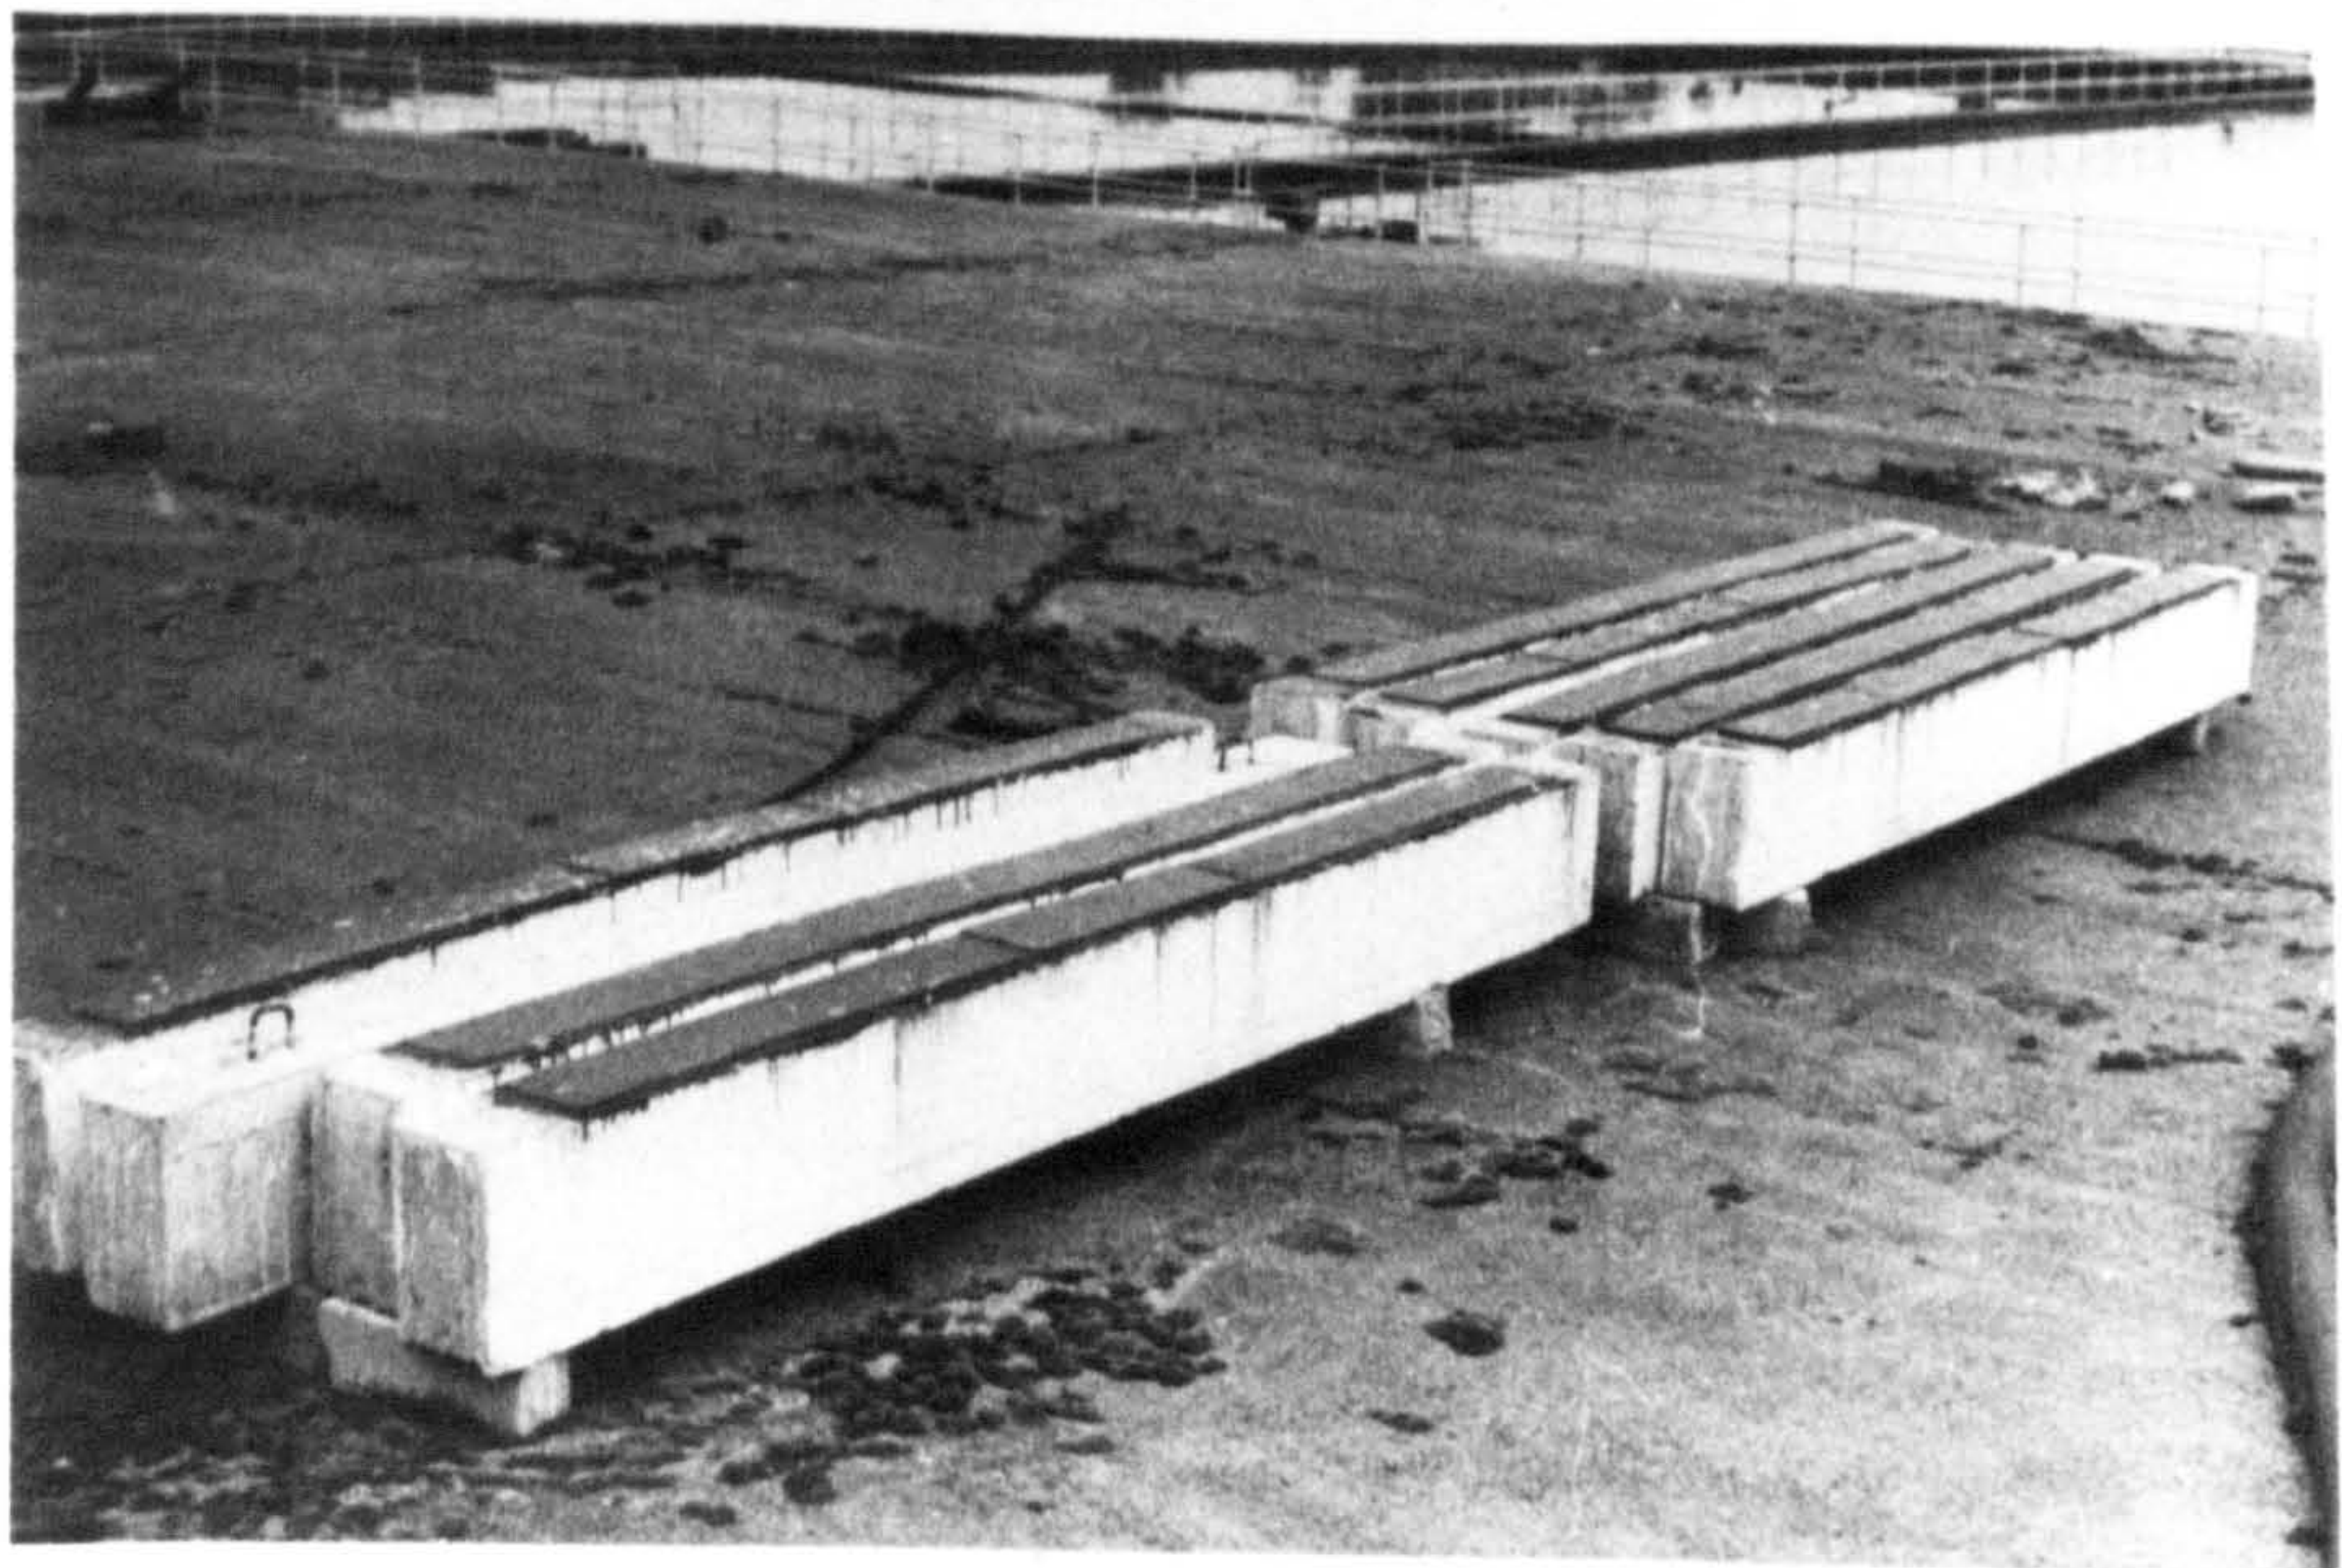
LONG TERM TESTS : UNLOADED BEAMS
